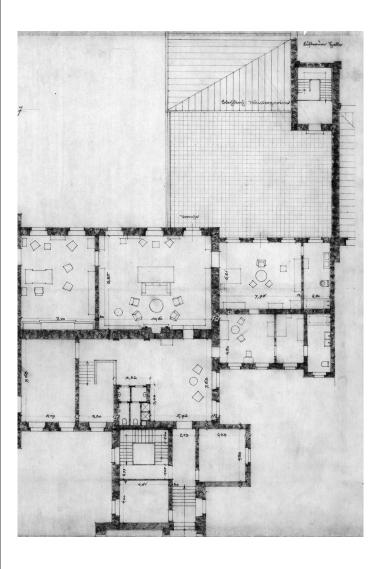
Atelier Troost, plan of Hitler's renovated private apartment on the second floor of the Old Chancellery at 77 Wilhelm Street in Berlin, n.d.
